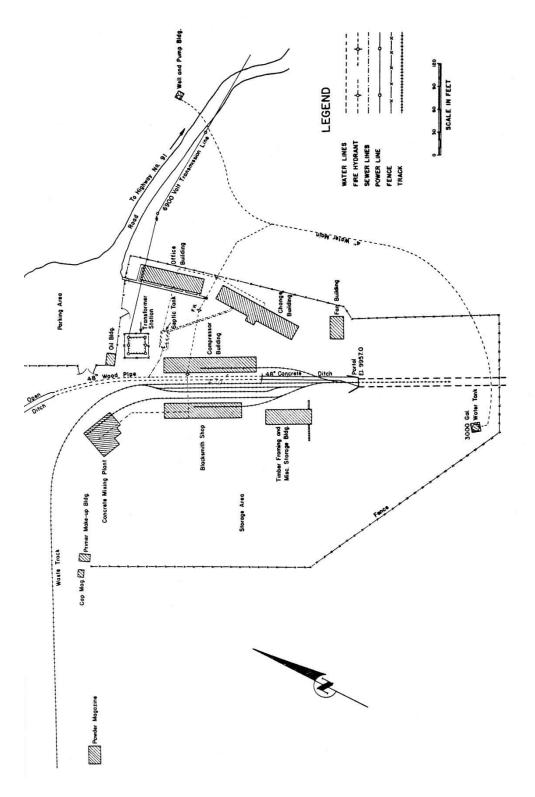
Surface plant facilities erected for construction of the LMDT. Note the track for disposal of excavated soil and rock turns to the southwest (Elgin and Others, 1949).
